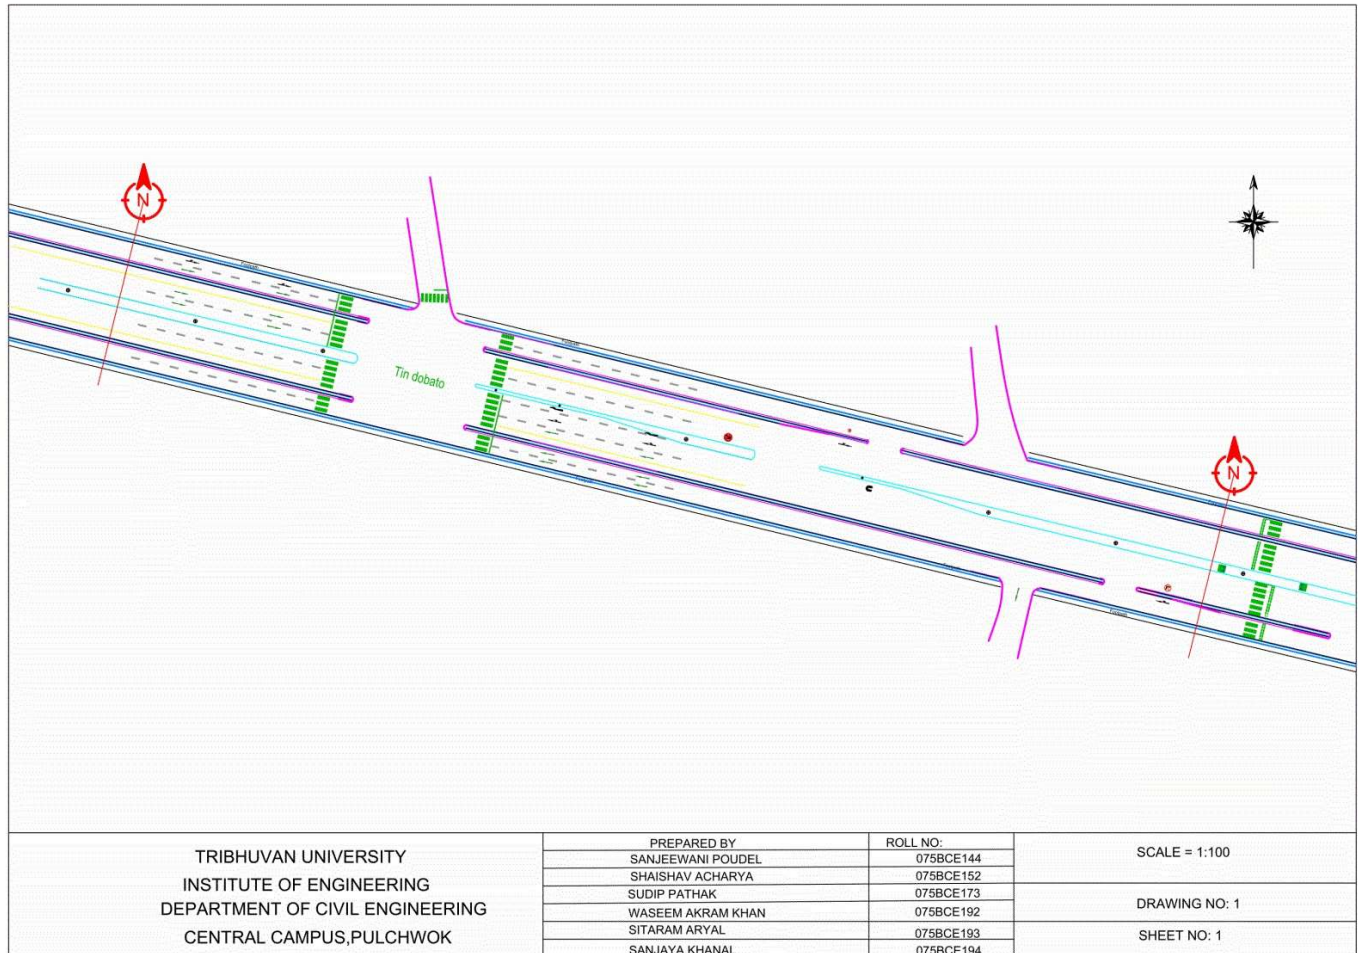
Proposed AutoCAD Plan for Tindobato Section
